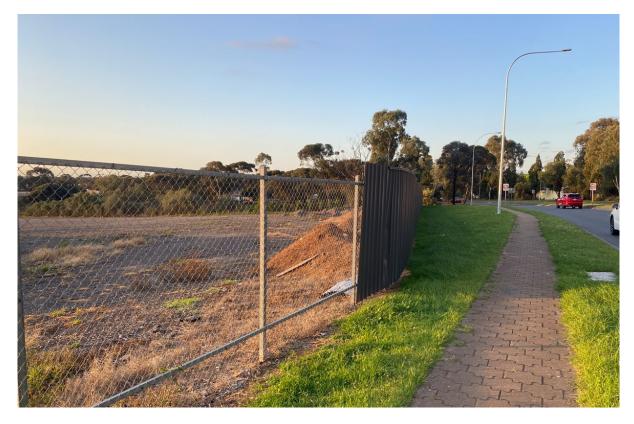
View North along the Bridge Road frontage of 256-258 Bridge Road
